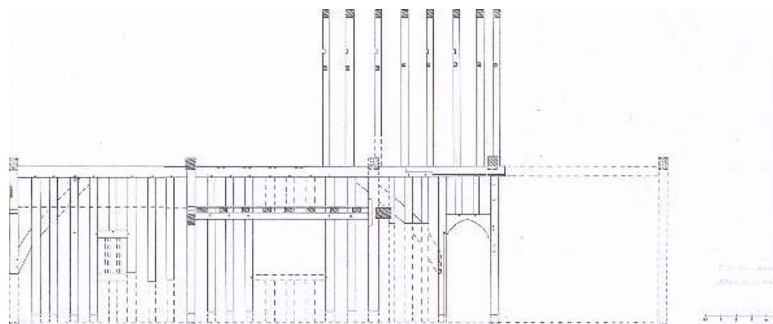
Butlers Farm , Wrabness, plan of medieval hall house
